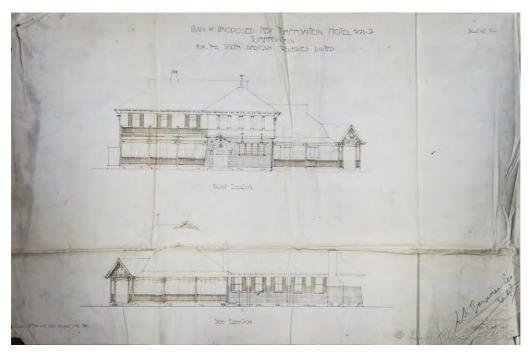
Original plan showing proposed Turffontein Hotel front elevation from 1905 (Source: City Council of Johannesburg, Plans Archive)
